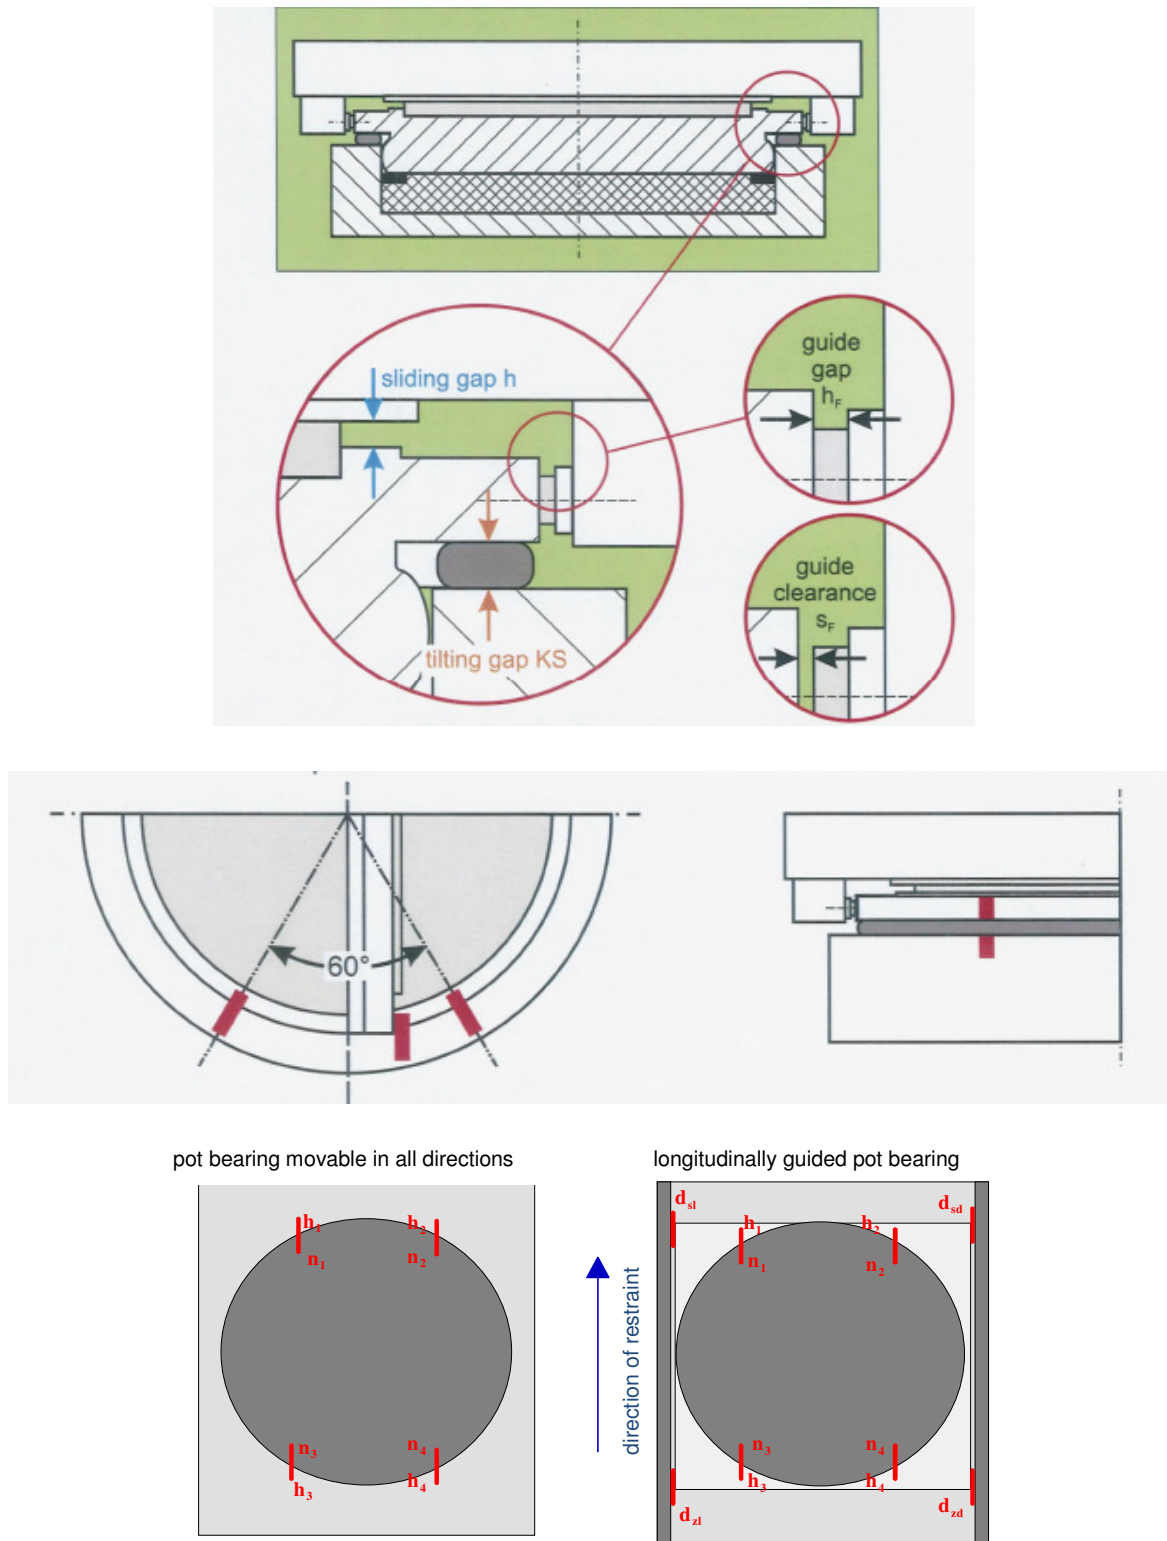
Mark on upper plate of bearing and measuring instruments for bearing equipment according to ZTV-ING
